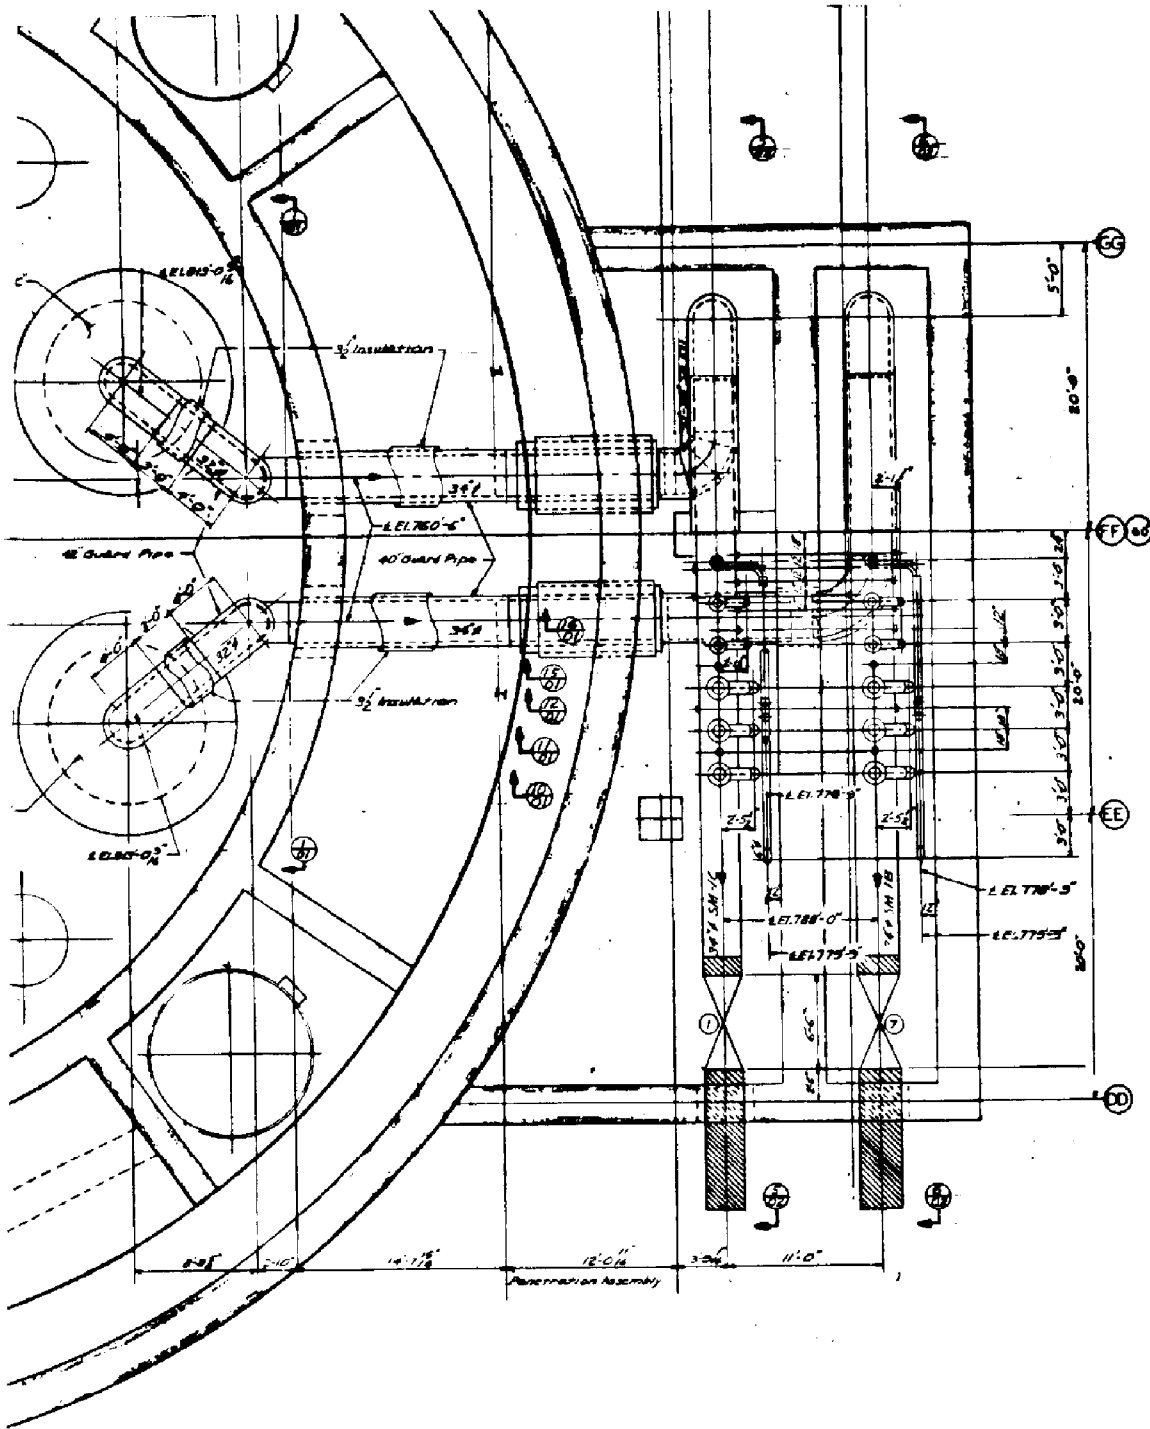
Main Steam Routing Elevation Outside Containment Nearest Reactor Building Wall
